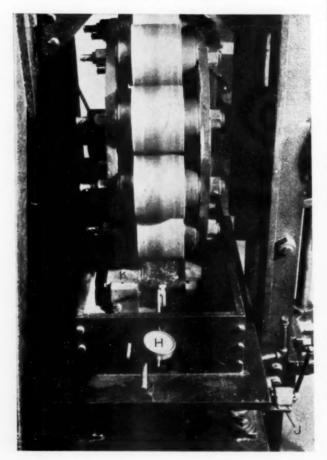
A SPECIMEN IN PLACE READY FOR TESTING.
